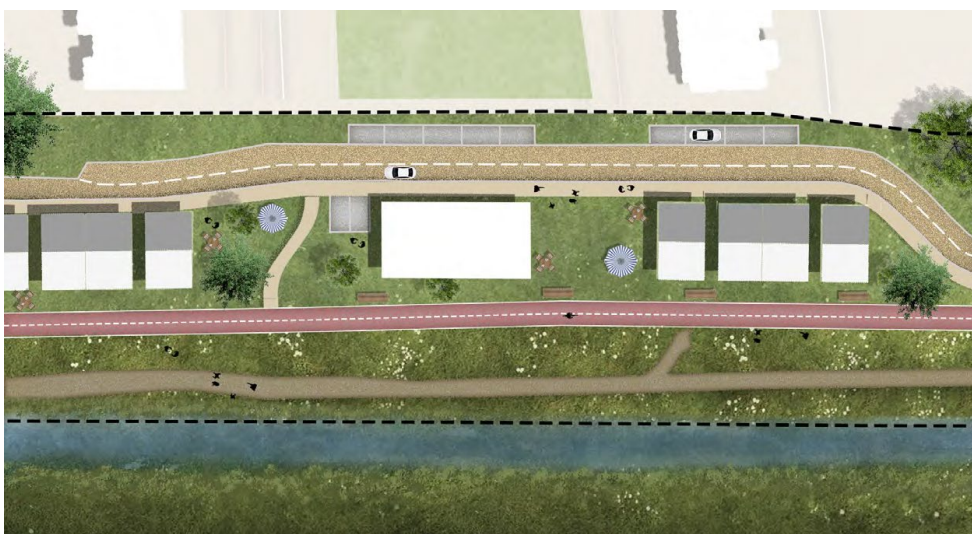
Proposed Landscaping – Old School House Building (Extract from Figure 7-3 of the Draft Old School House Masterplan, FCC 2025)
